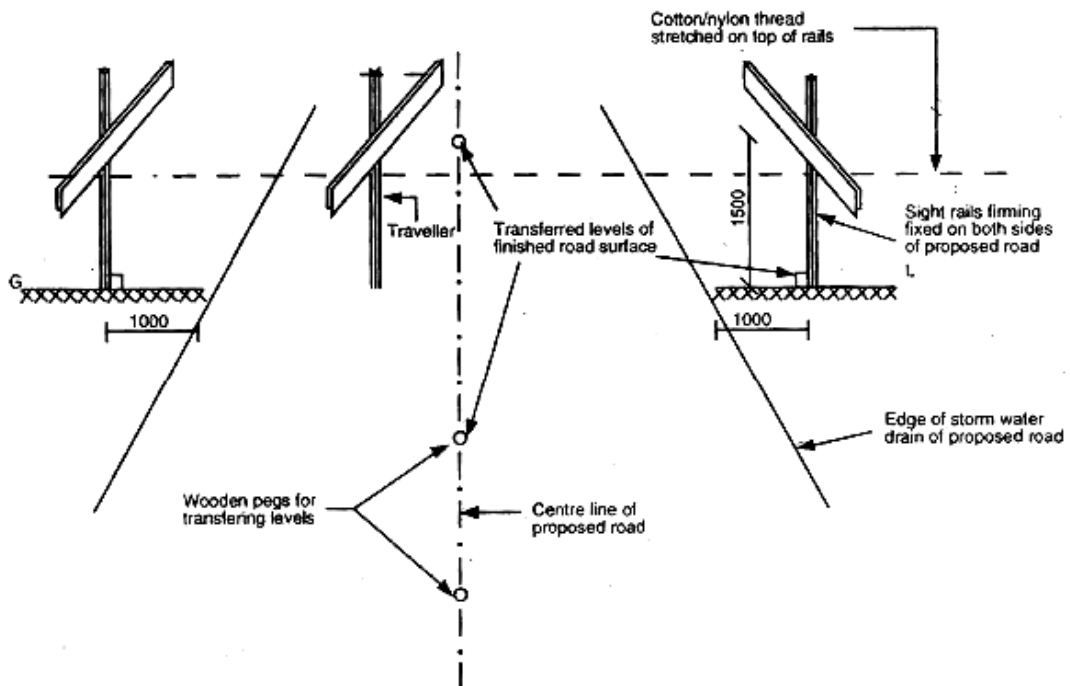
Details of Sight Rails and Traveller for Setting Out a Road
